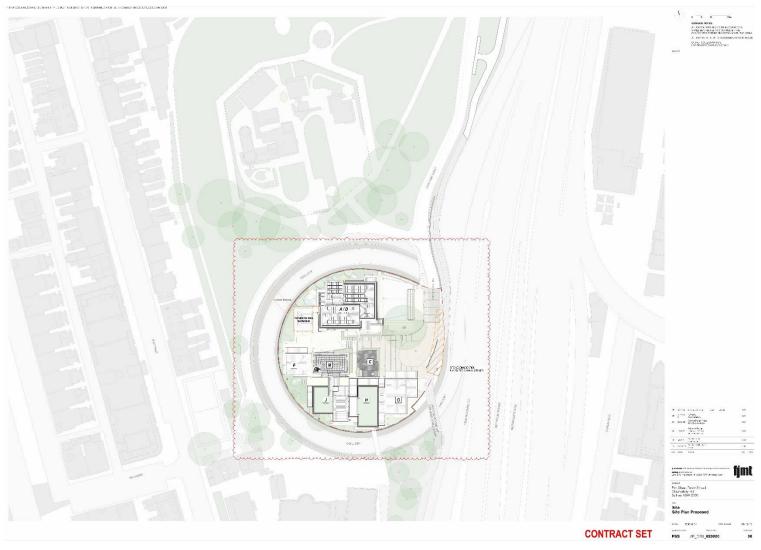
Site Plan proposed. (Source: Lendlease, 2021)
